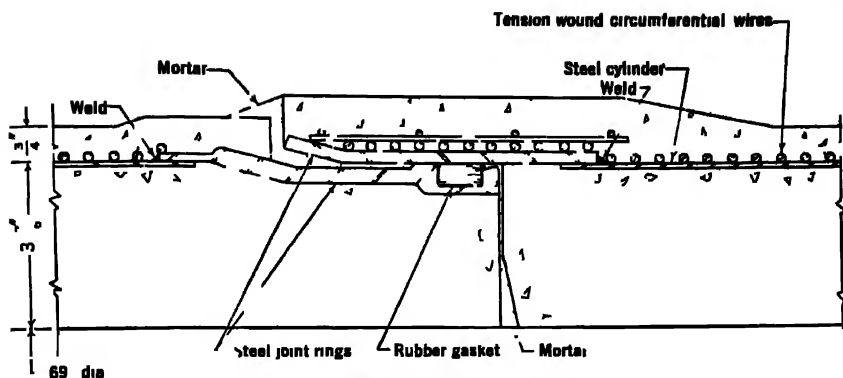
Cross-section of a 69-in. prestressed concrete pipe. (Lock Joint Pipe Co.)
